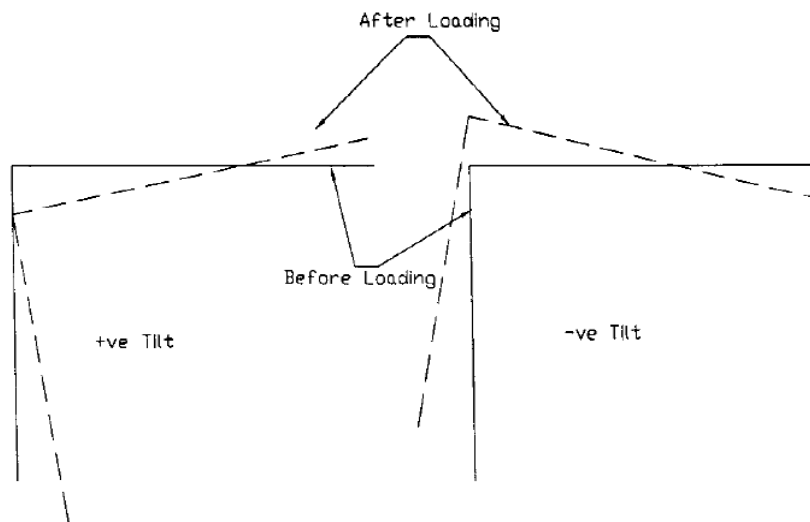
Sign Conventions for Tilt Footing (source: Mahiyar and Patel, 2000)
